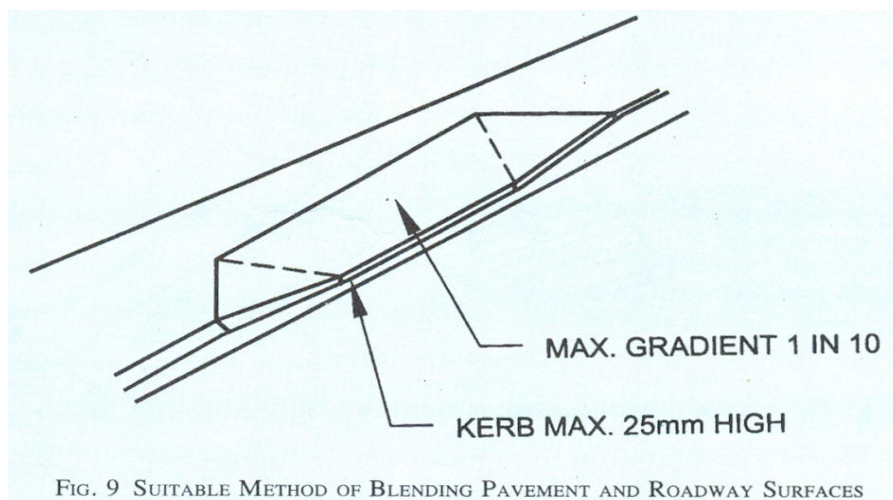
SUITABLE METHOD OF BLENDING PAVEMENT AND ROADWAY SURFACES
